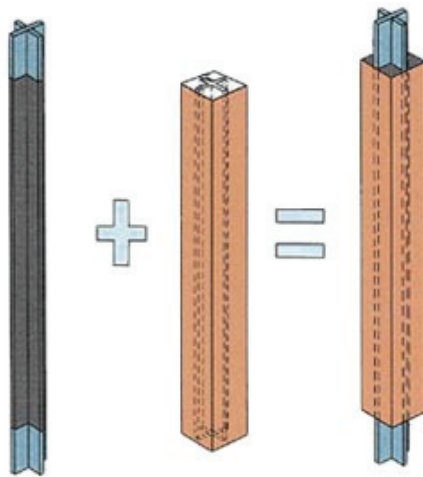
Schematic Construction Information for the Unbonded Brace
